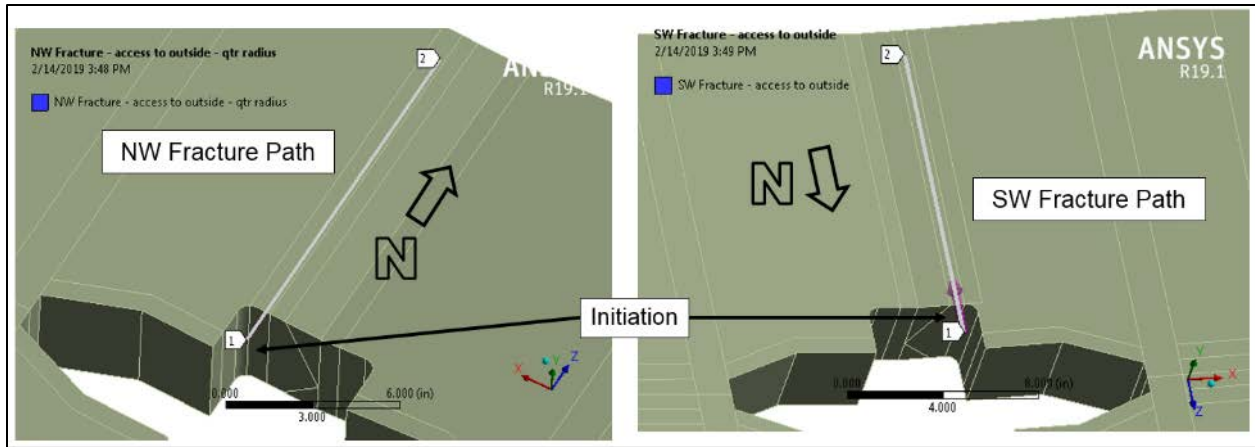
Stress paths through the mid-thickness of the bottom flange originating at the NW and SW weld access hole fracture initiation sites.
